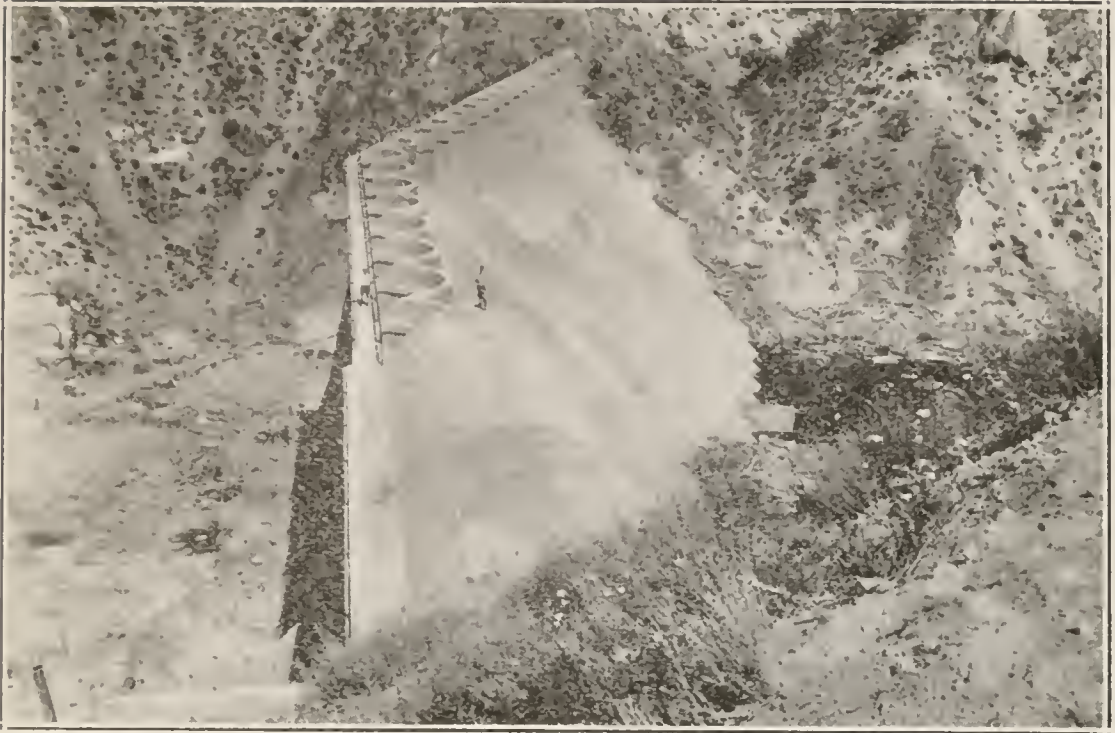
Newly-built storage dam of Palmdale and Littlerock Irrigation Districts.
